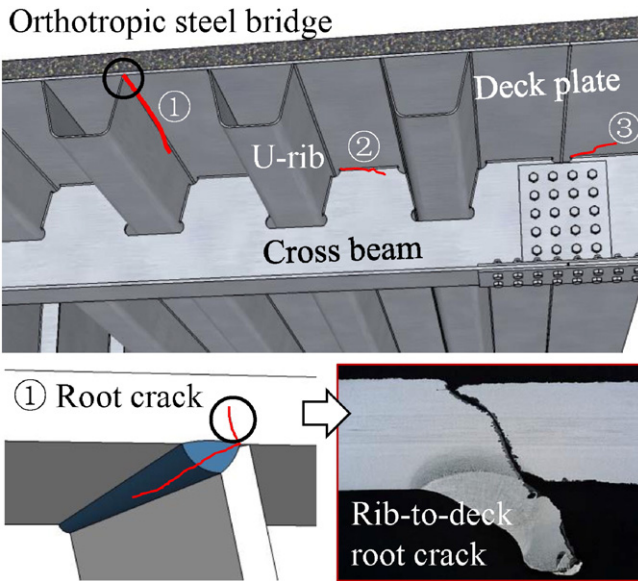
Typical fatigue cracks in orthotropic steel bridges.
